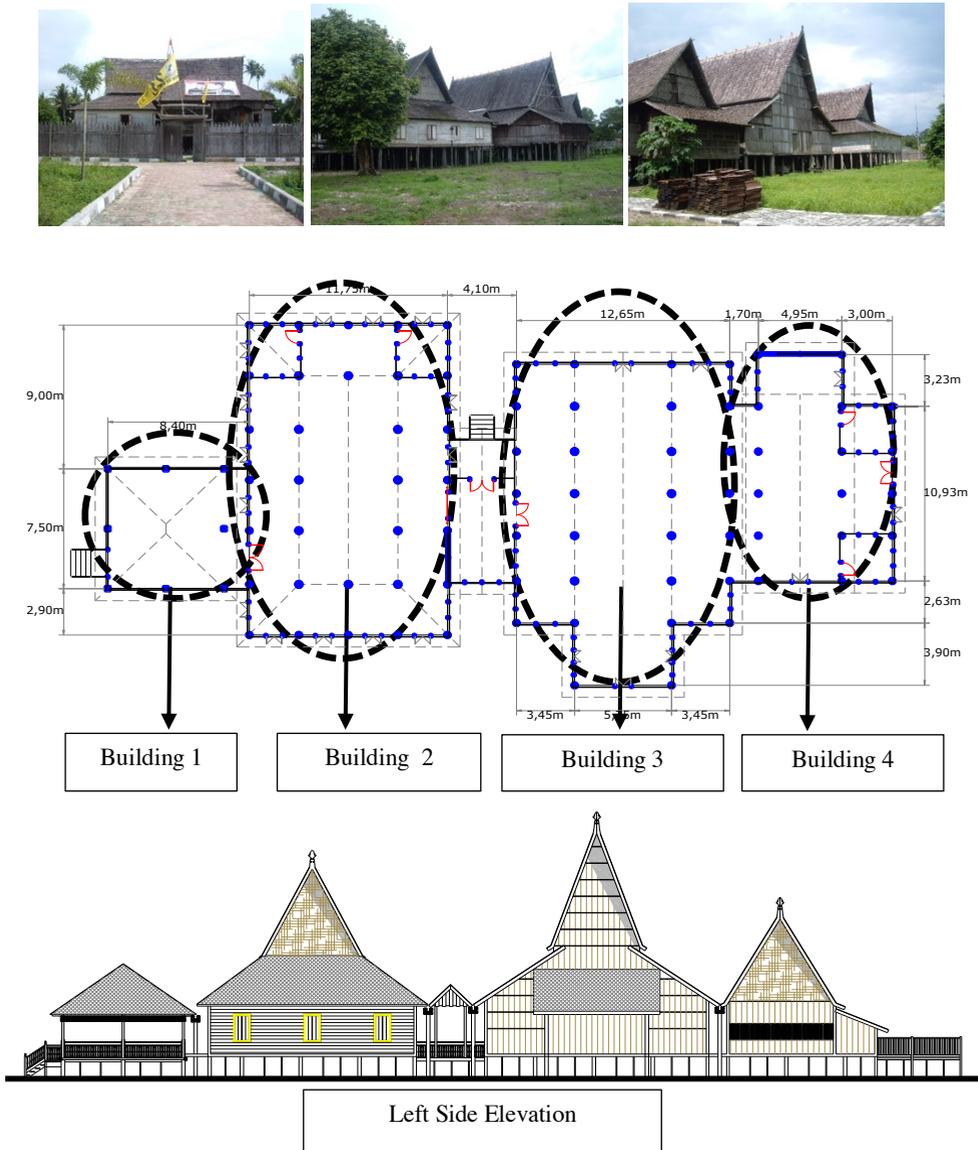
Photos, floor plans and side view Astana Al-Nursari.
